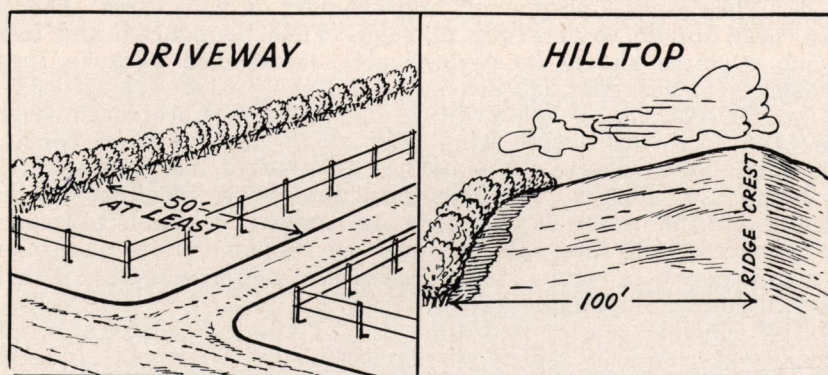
Snow fence plantings should be placed at least 50 feet back from driveways or roads. Place hilltop snow fences 100 feet on the windward side of the ridge crests.
